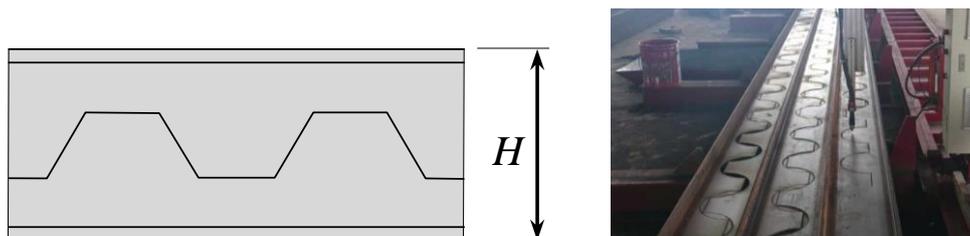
Creating castellated girders using cutting and welding [1]
